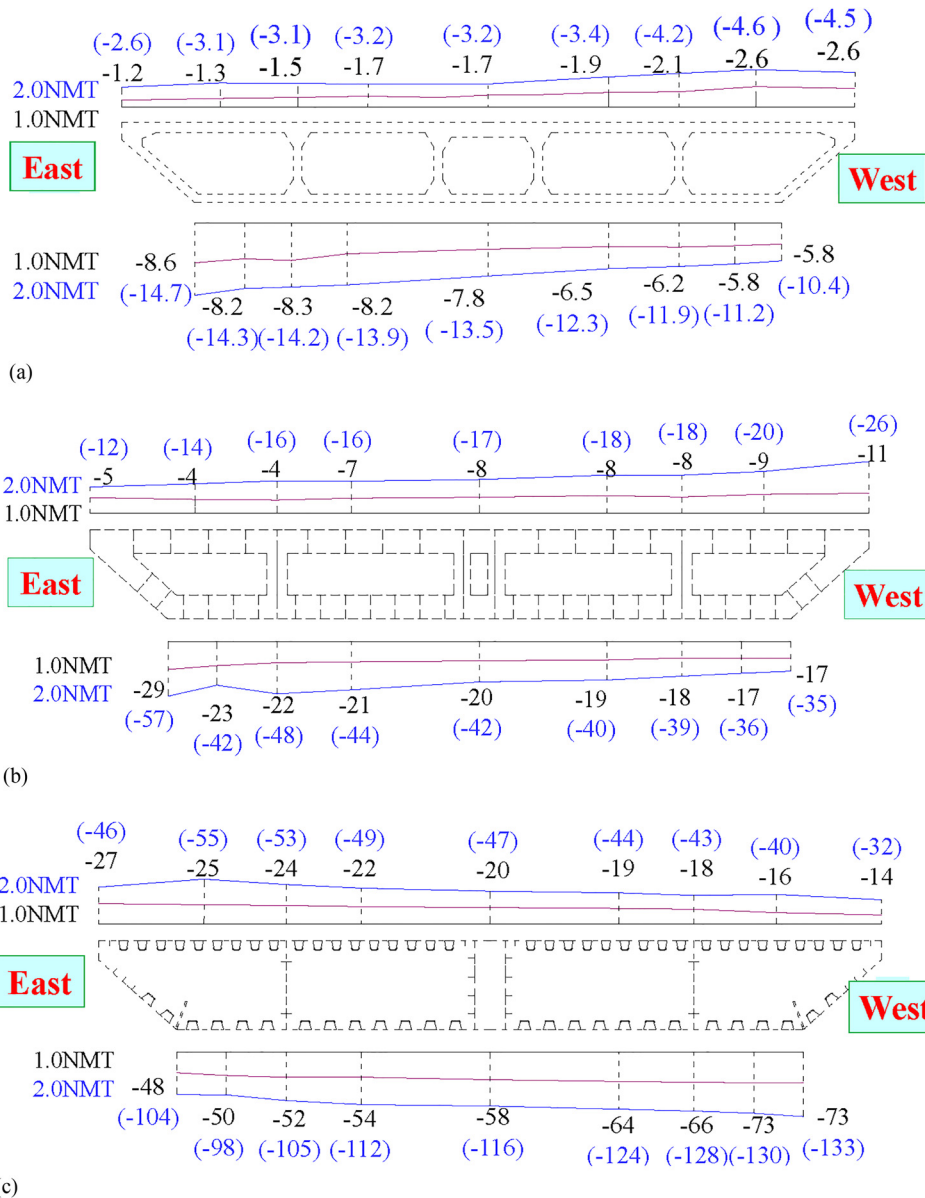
Axial nominal stress distributions: (a) PC girder (C-C); (b) steel-concrete joint (J-J); and (c) steel girder (B-B).
